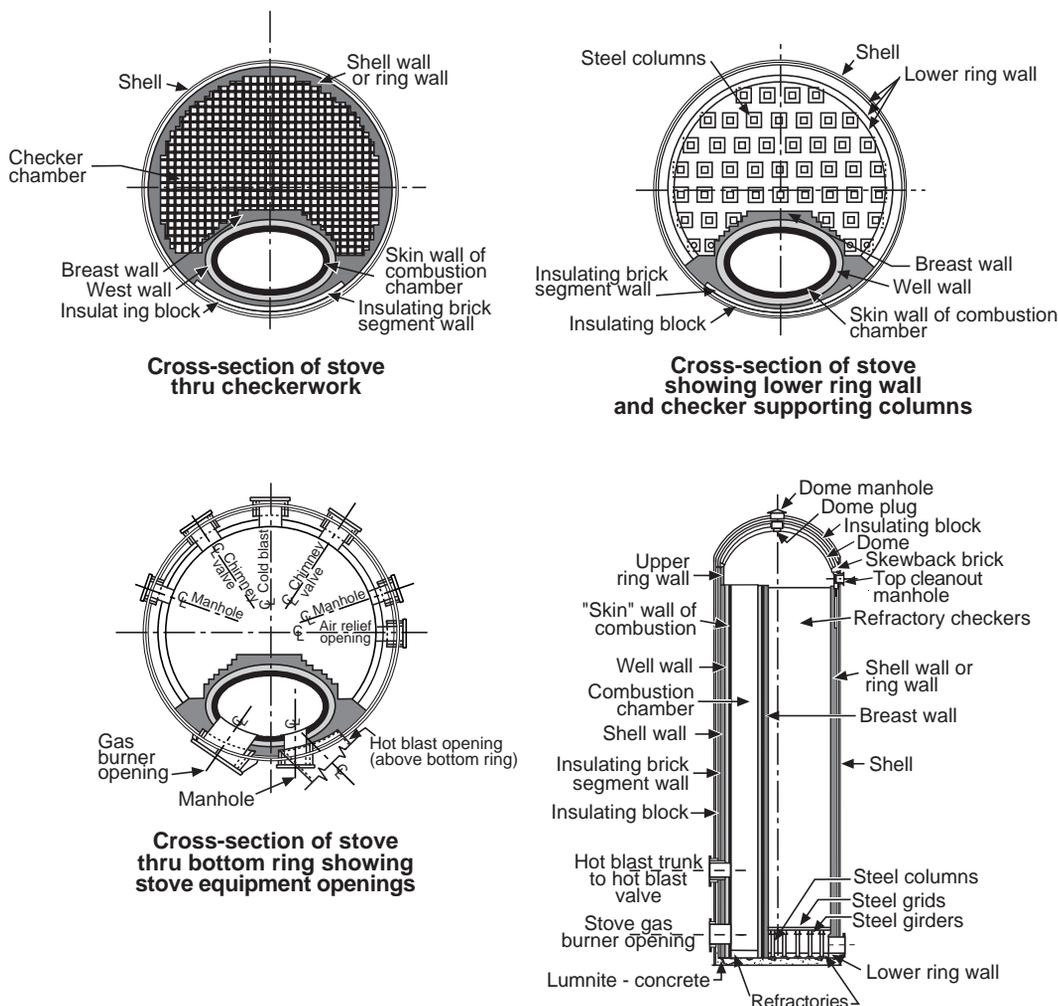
Vertical section through a stove with cross-sectional views at several elevations.
